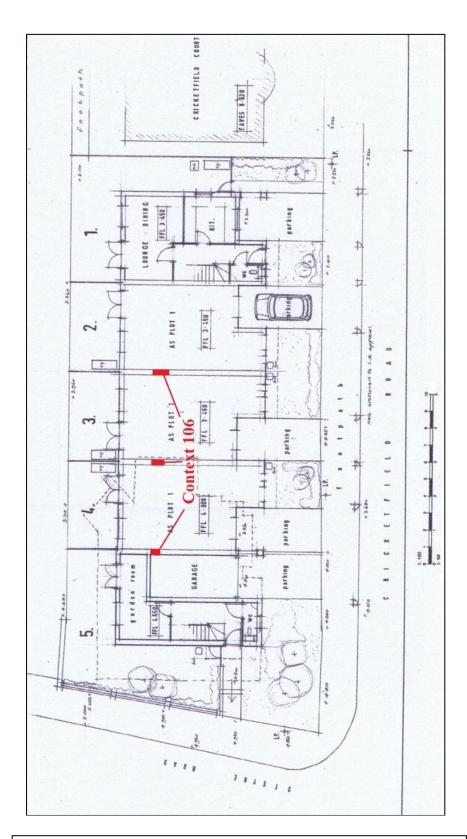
1 Cricketfield Road, Seaford: Site development plan showing location of Context 106
